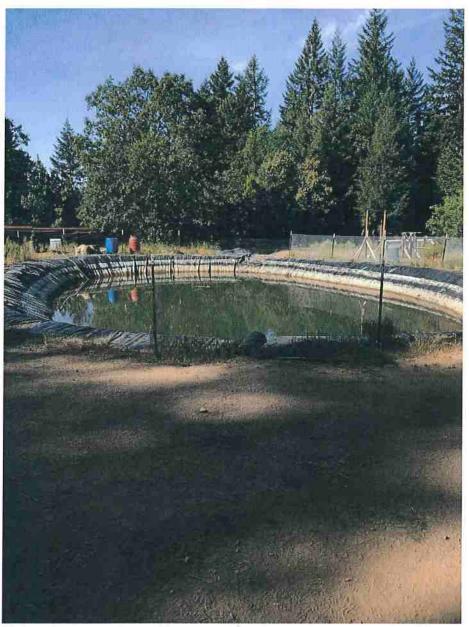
Looking south at retaining pond constructed in channel of Class III watercourse (Observation Point 1(b)) from crossing STX1 at Conversion Area #1.
